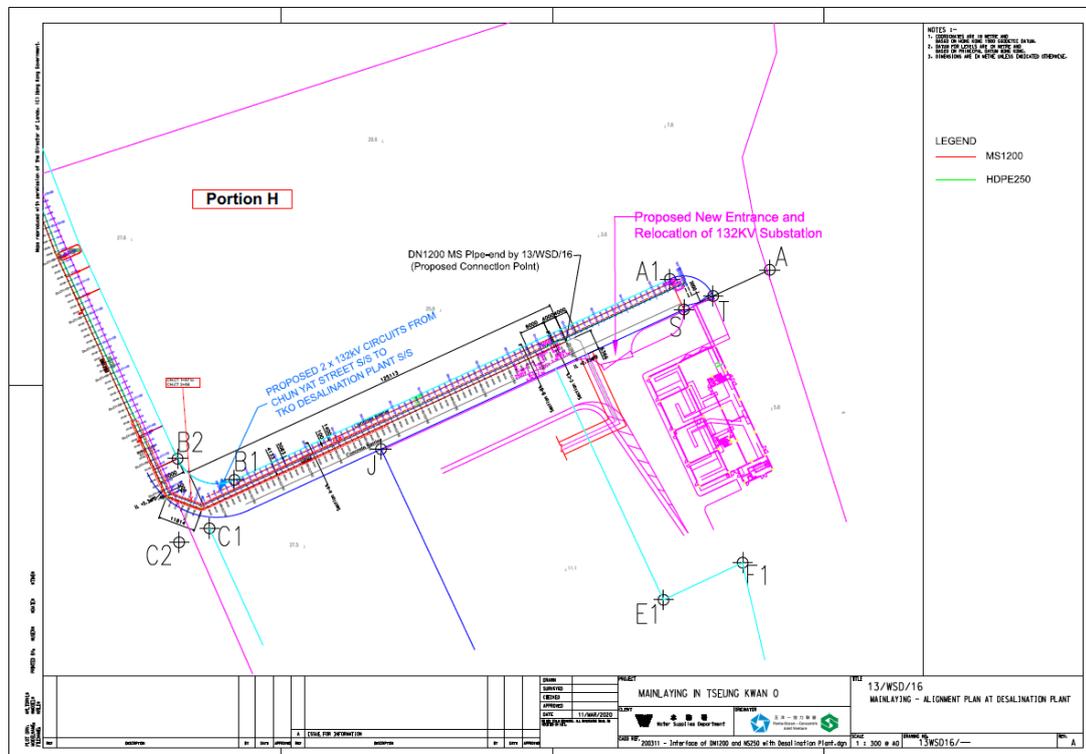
Location Plan for CH.CT 0+07 - 2+58
